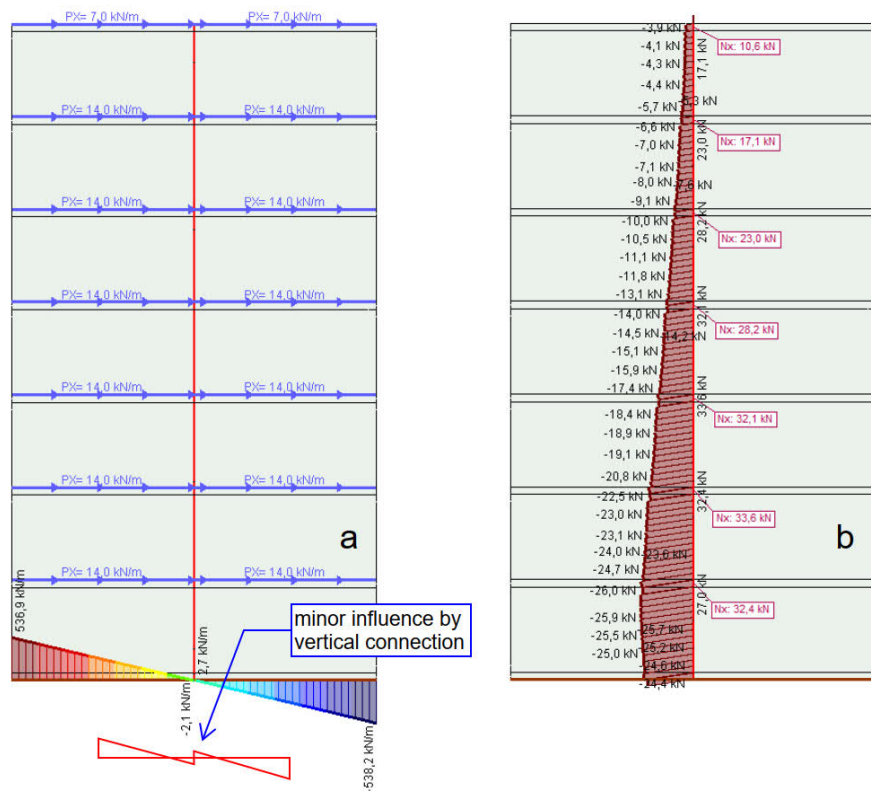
Case study cantilever shear wall with Staggered shear key connection: Lateral loads and vertical reaction forces (a) and an overview of shear forces and slab forces in SLS (b)
